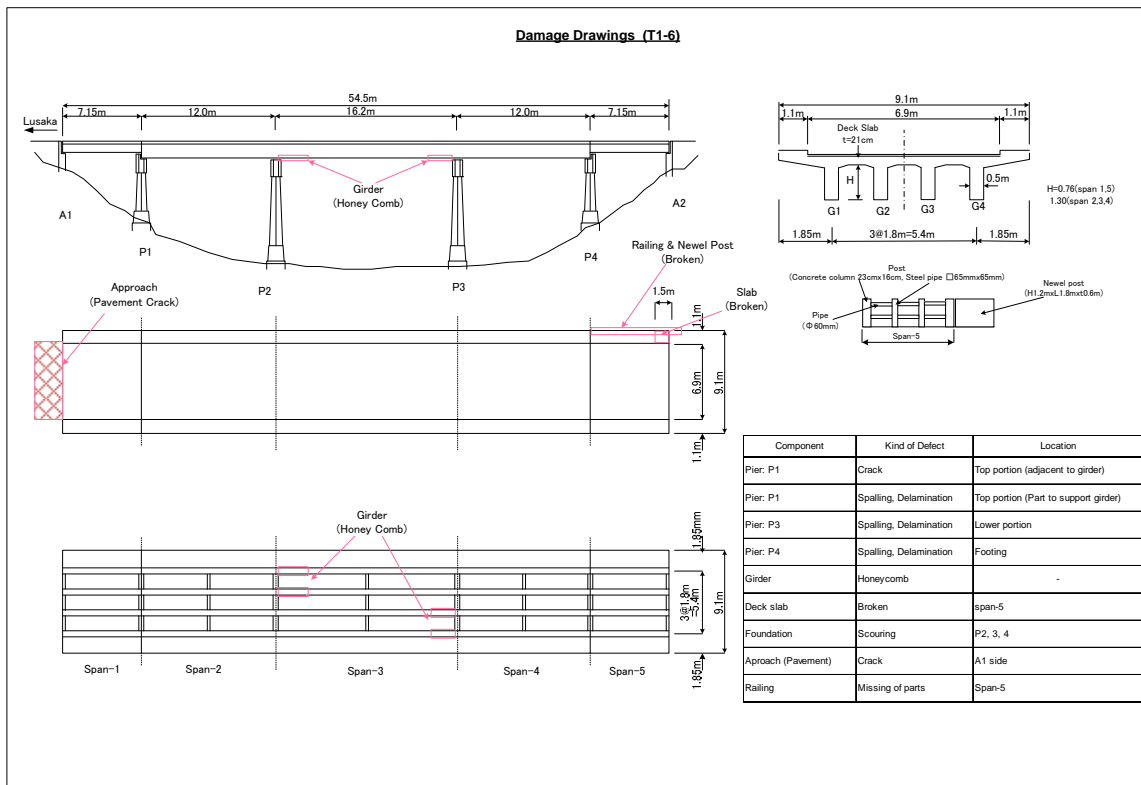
Example of Damage Drawing (T1-6 Bridge)
